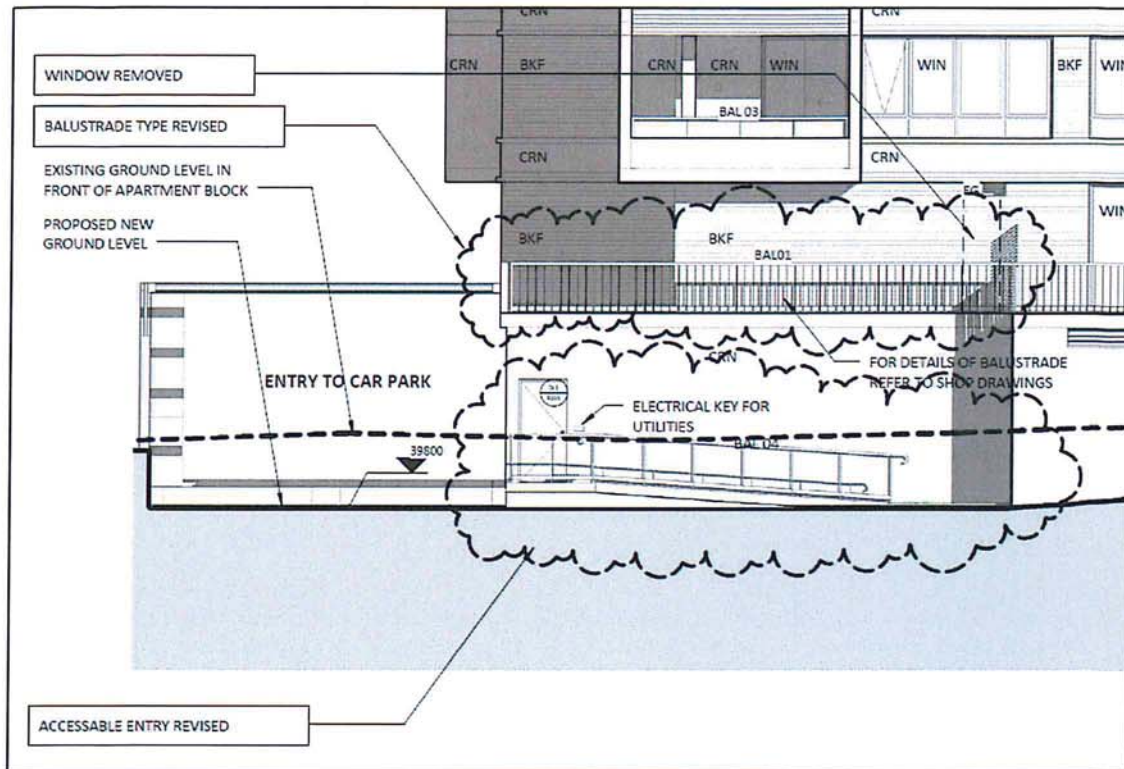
Revised disabled access and changes to ground floor unit 5A. (Source proponent's application)
